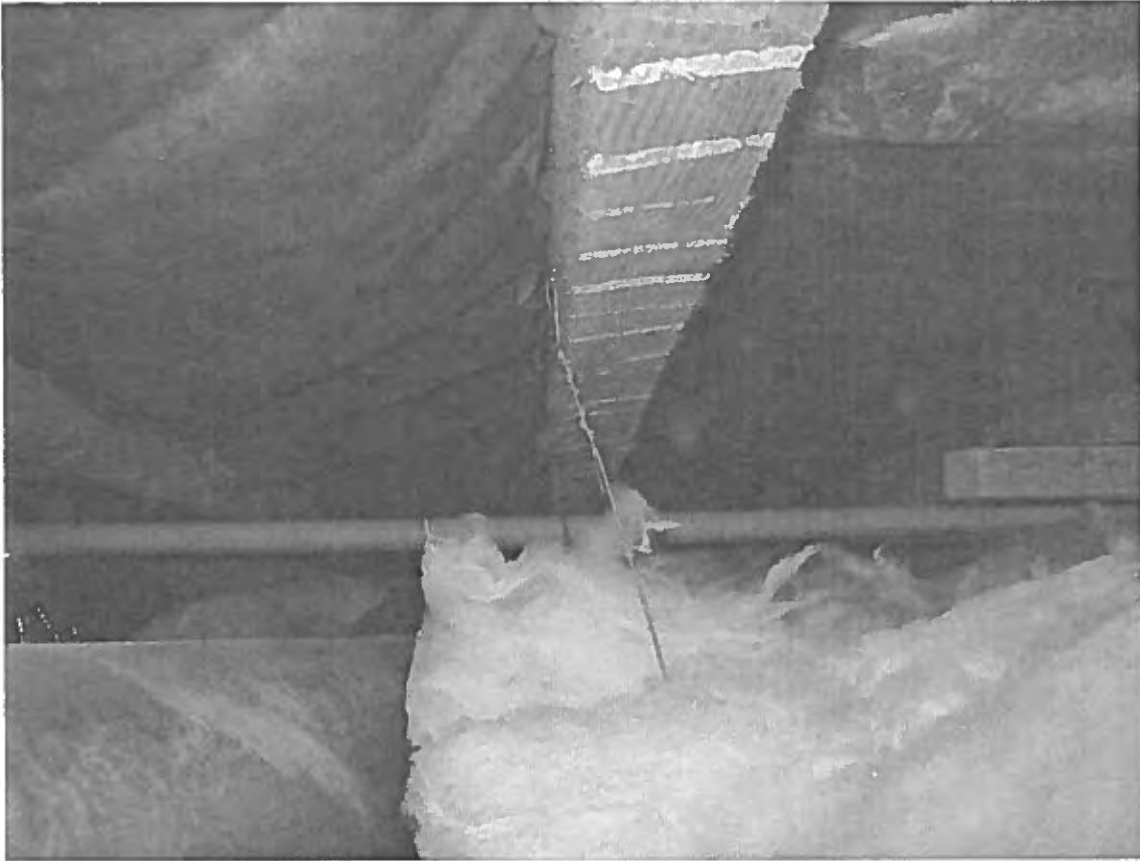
Roof joists and ceiling joists 2 x 8 @ 16"
